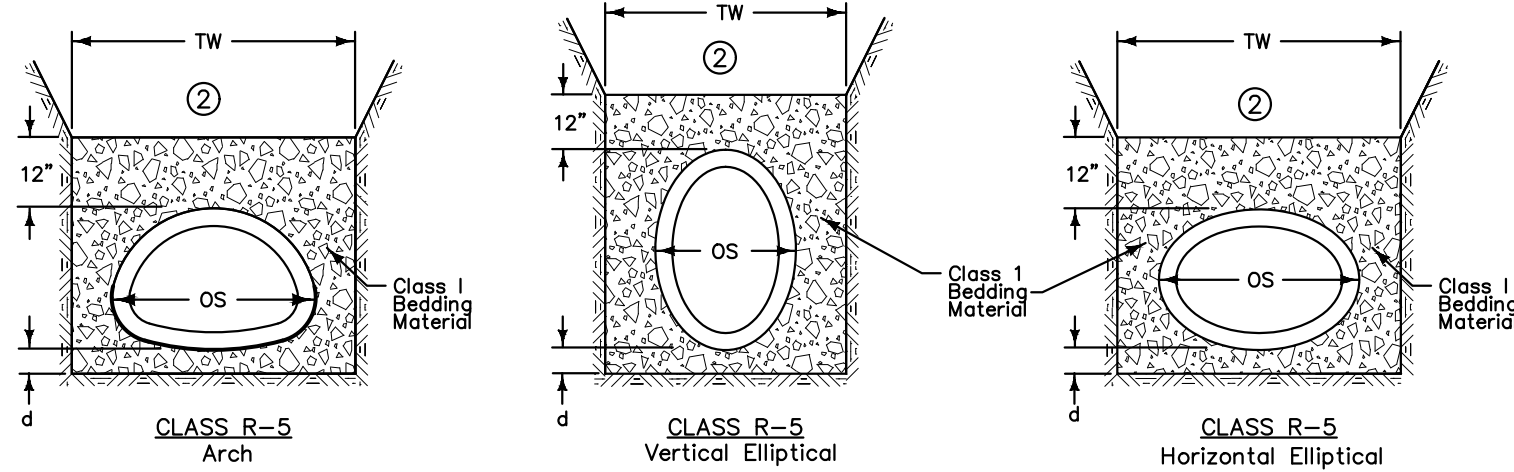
STANDARD ROAD PLAN	REVISION	2	04-18-17
